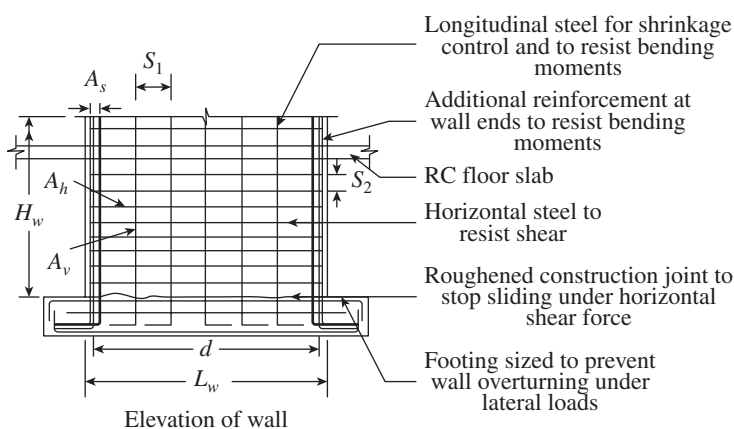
Geometry and reinforcement detailing of typical structural wall
